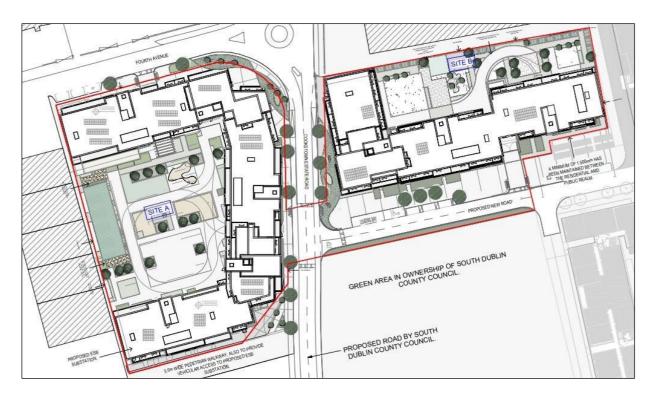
Site Plan proposed under Section 247 Meeting Ref. No. SHD1SPP021/18
